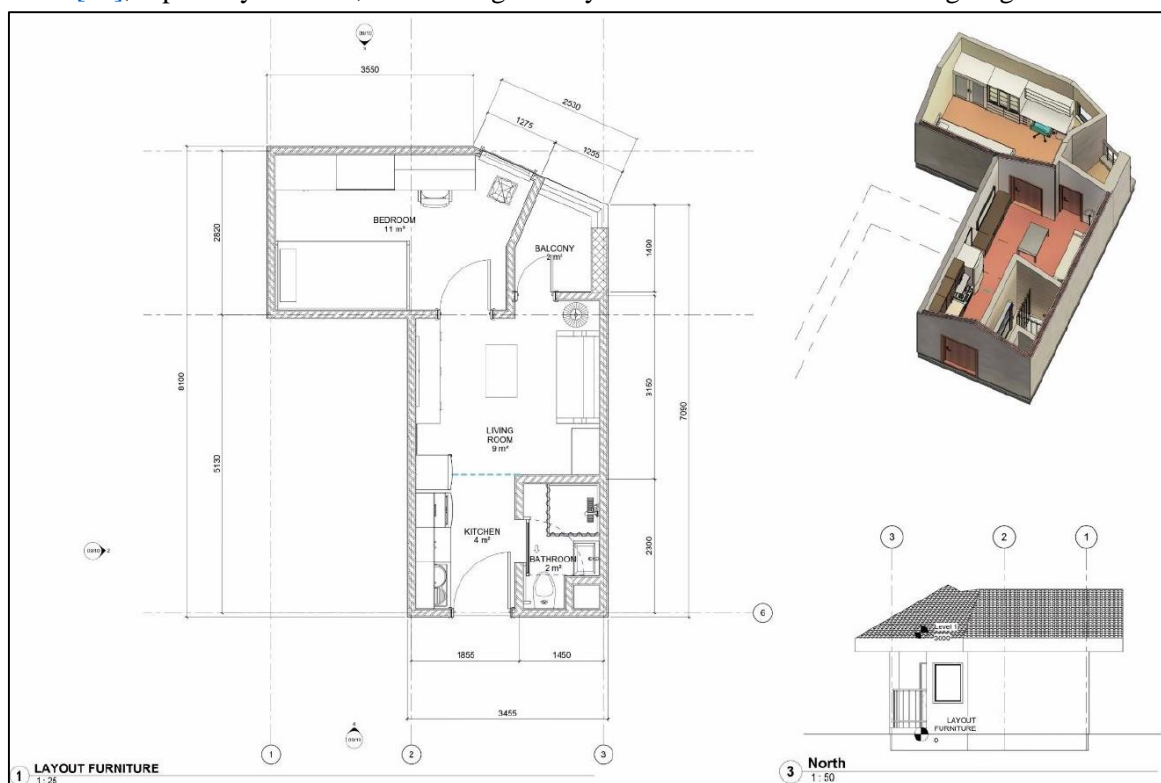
Example of an interior layout plan integrated with elevation and 3D perspective in Autodesk Revit.
